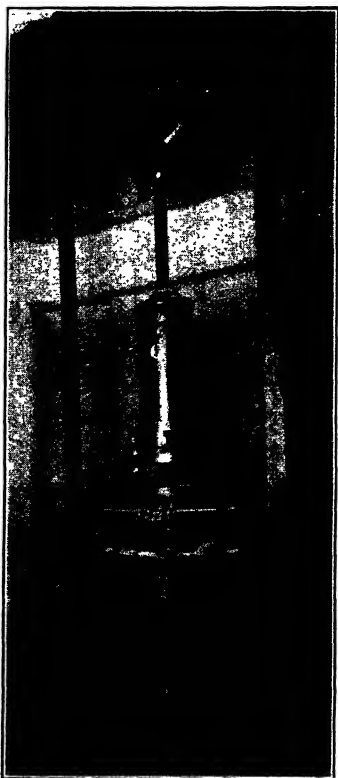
DIAMOND-DRILL HOLE CABLE SUPPORT ON 2200-FT. LEVEL.
